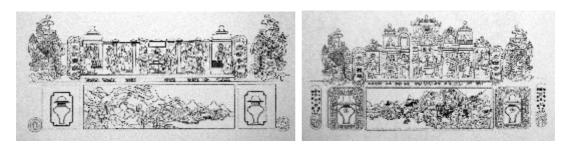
The front elevation of the decorative plasterworks on the ridge of the roof in two sides halls of the first halls.
